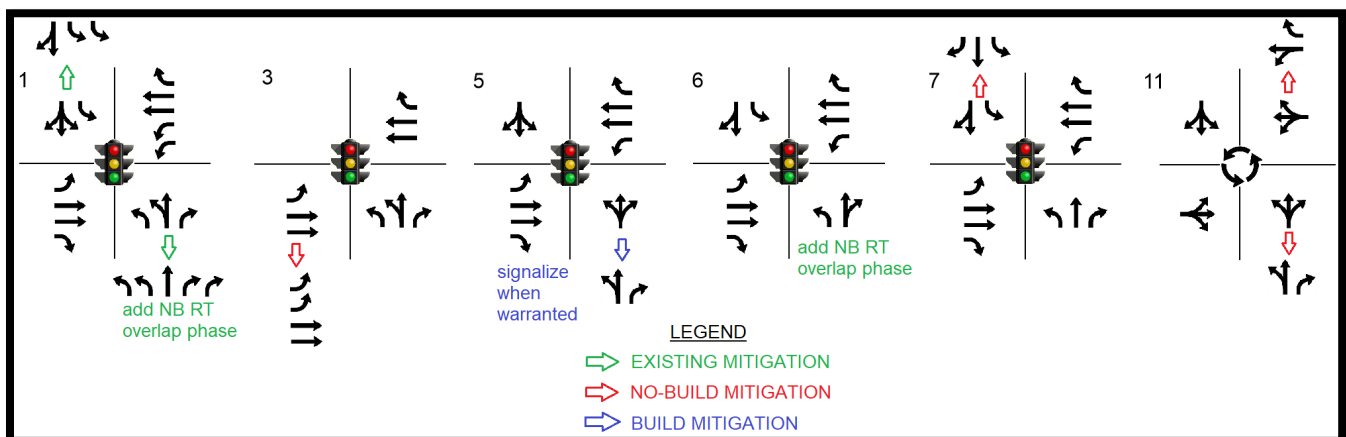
Existing, No-Build, and Build Recommended Mitigation
